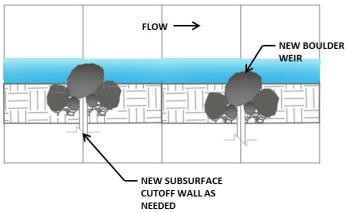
Example Boulder Weir with Cut-off Wall to Prevent Piping.
